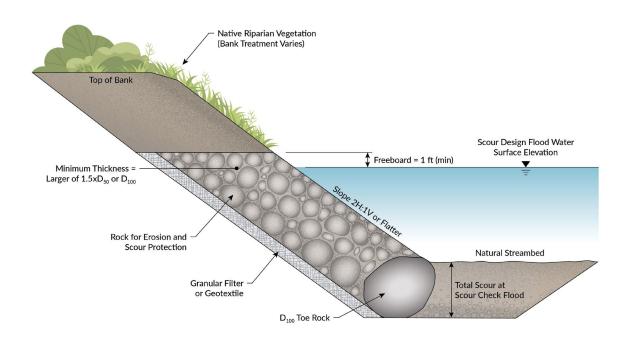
Typical Cross Section of Rock Bank Protection Installation
